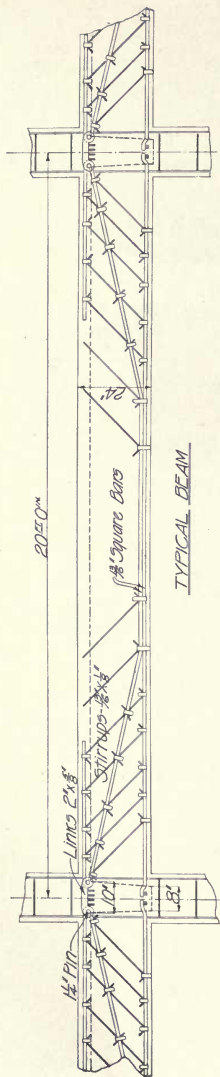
Details of Typical Pin-Connected Beam and Girder Reinforcement. (See p. 165.)
